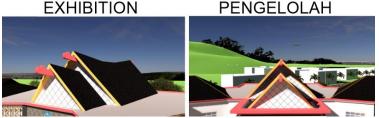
Application of *Kalosara* shape on the building (exhibition building on the left, management building on the right) (Source: Author)
